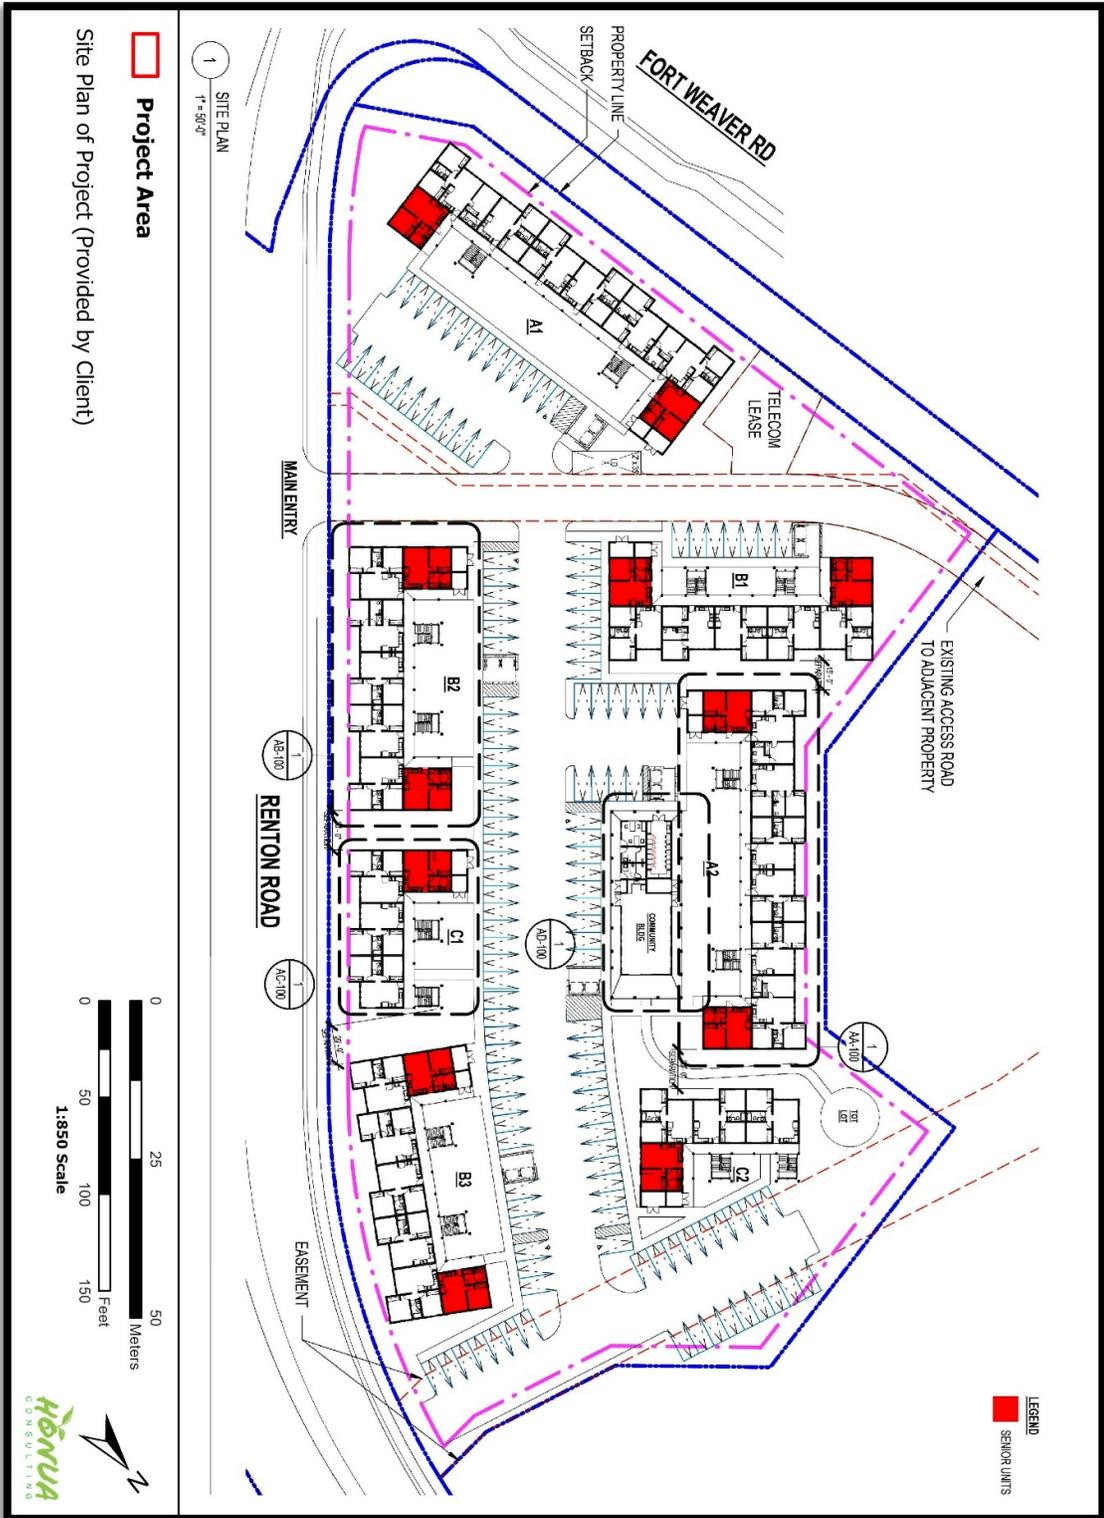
Preliminary construction plan for the West Loch Affordable Housing Project (Provided by Client)
